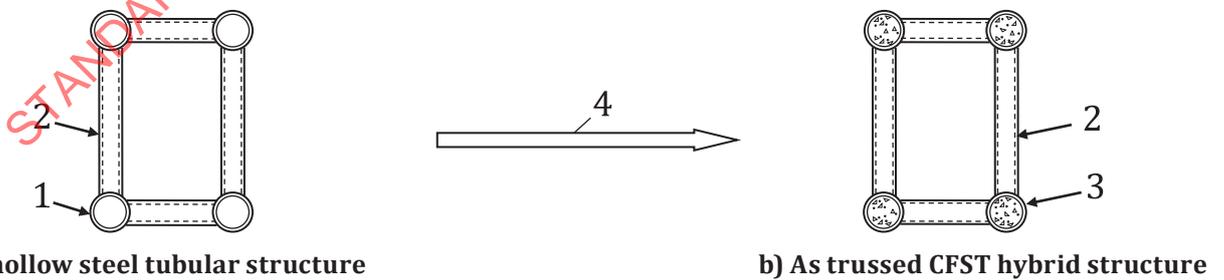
Cross-sections of trussed CFST hybrid structures with circular CFST members
